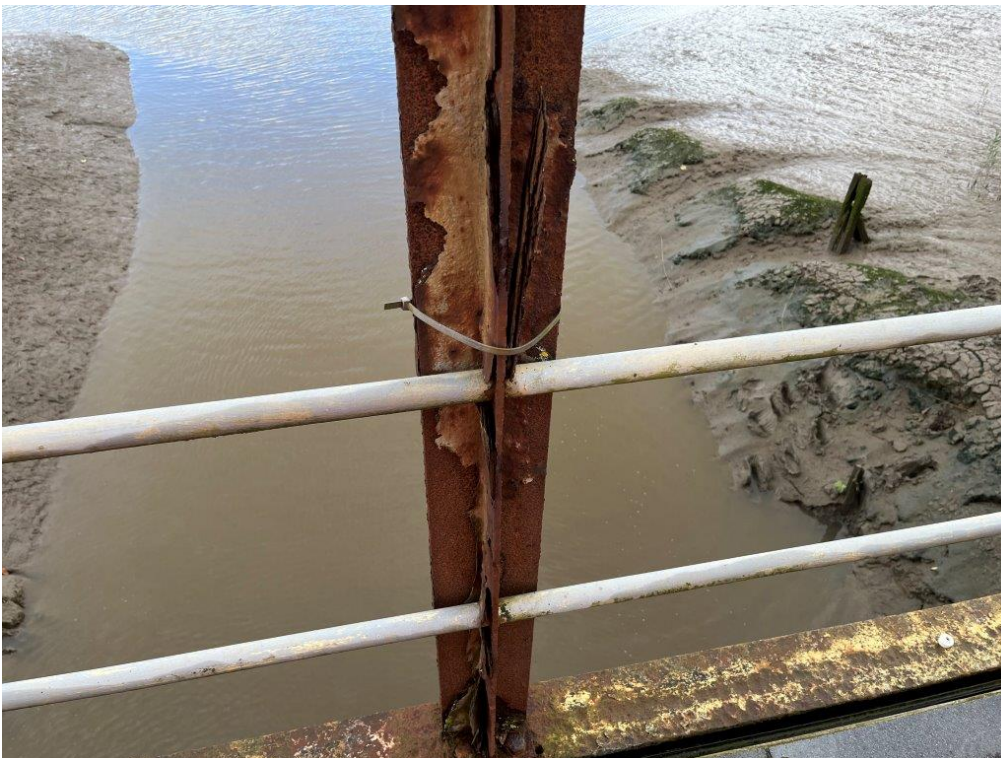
Thick lamination to US Handrail uprights (02/08/22)
